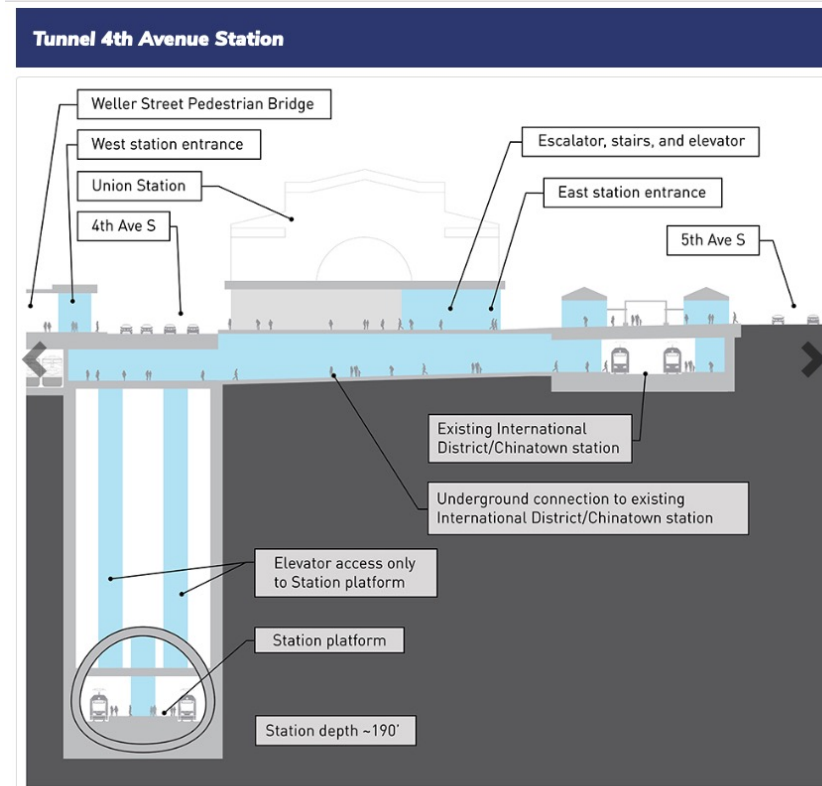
Plan and Profile for 4th Avenue Deep Station Option (CID-1b)\
